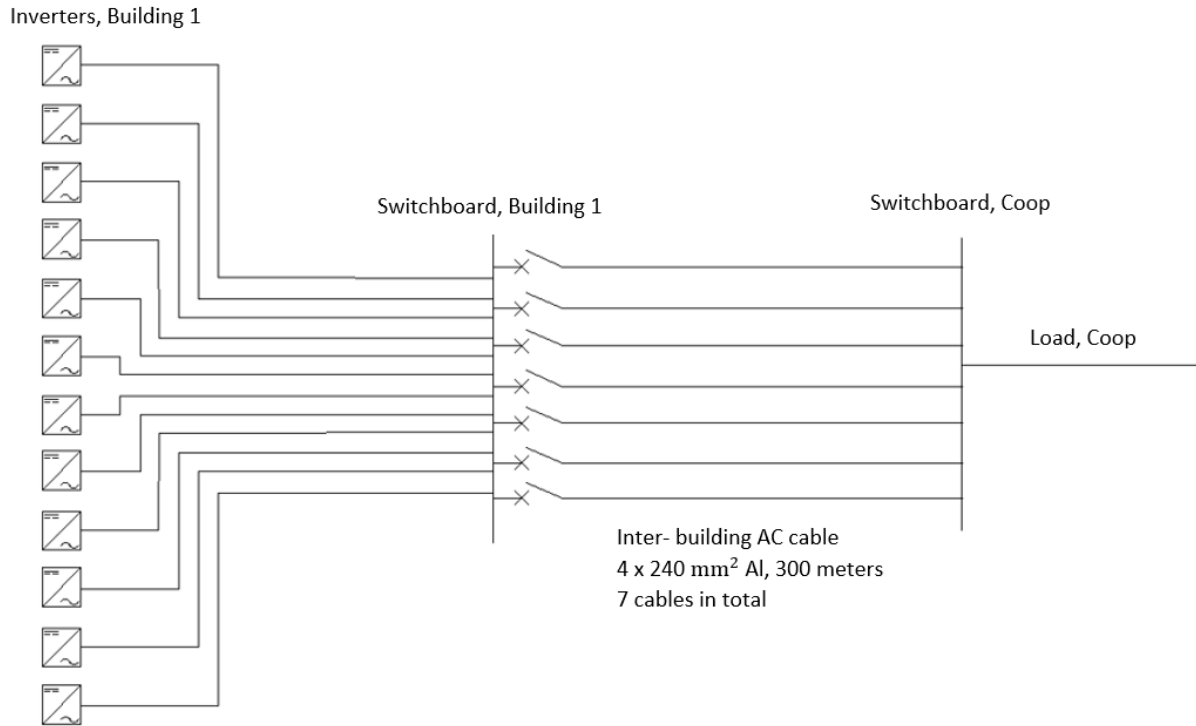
Schematic diagram of the inverters and switchboard in Building 1, and the inter- building AC cables connecting Building 1's PV system to Coops switchboard.
